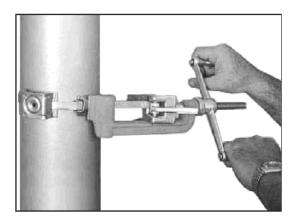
ATTACHING THE WELL TAG TO THE CASING
